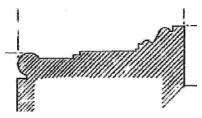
Trim for Windows 11 and 12. Section detail.
